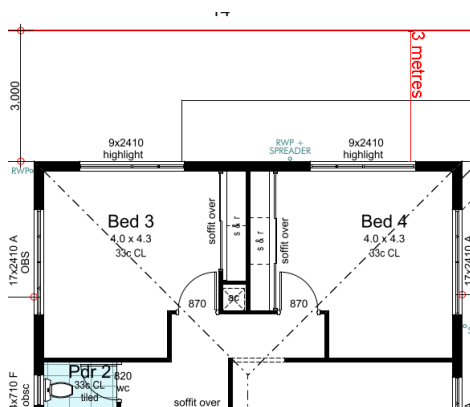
Revised Upper Floor Plan of Subject Site Showing Setbacks from Upper Floor to Rear Western Boundary
